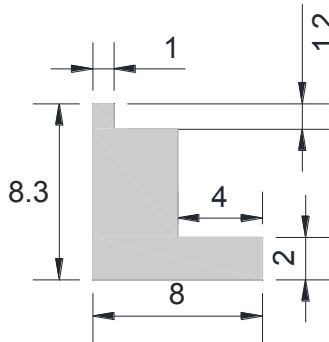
Cross section of a crown wall for a double-layer Cubipod[®] armored breakwater.
